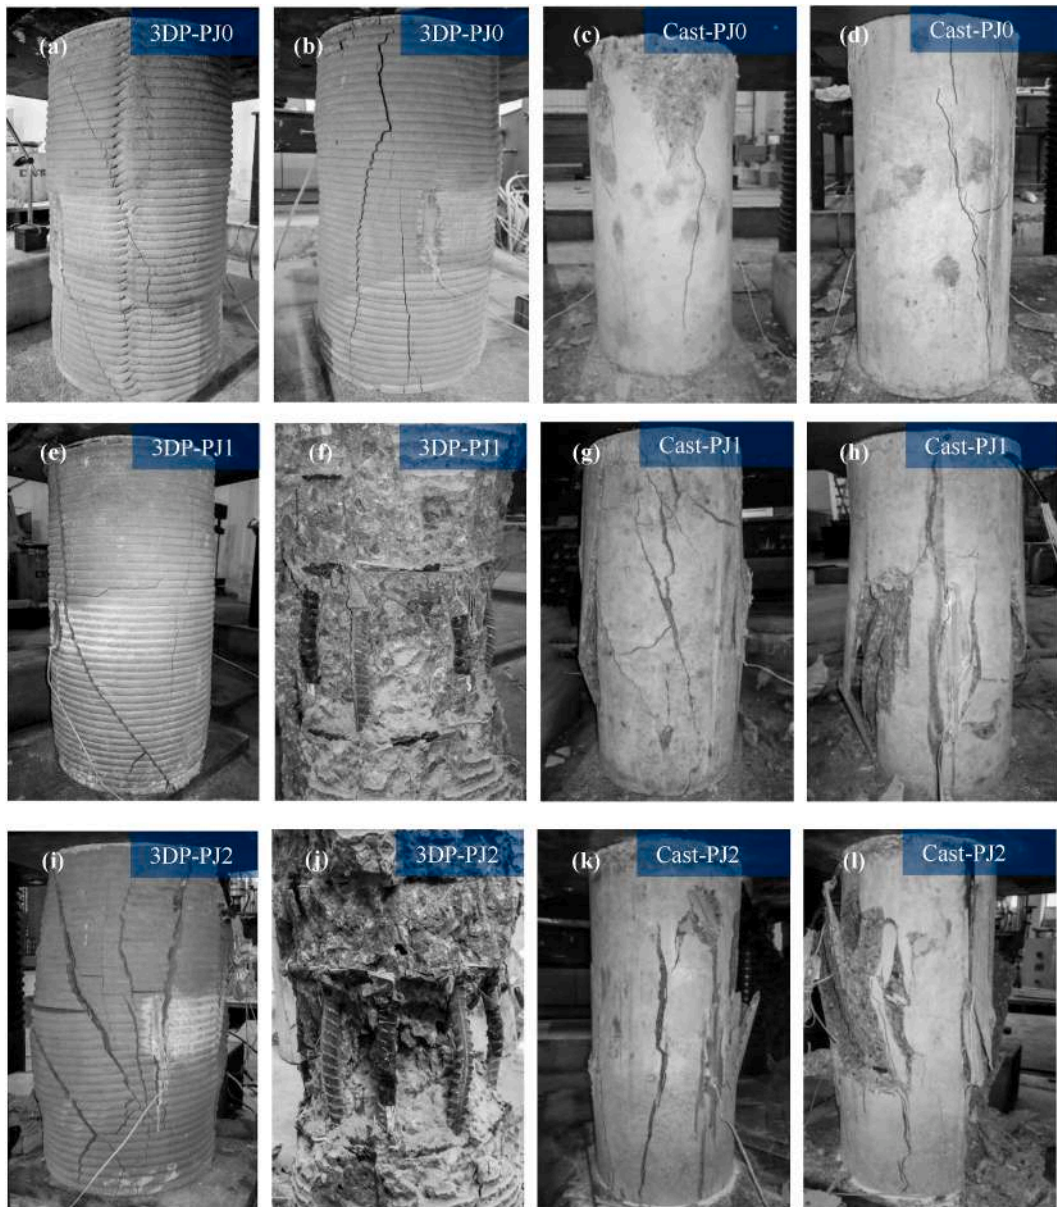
Failure patterns of all tested composite column specimens (a) Inclined crack of 3DP-PJ0 specimen at printing interval, (b) Final failure pattern of 3DP-PJ0 specimen, (c) Concrete spalling pattern of Cast-PJ1 specimen, (d) Main fracture formation of Cast-PJ1 specimen, (e) Final failure pattern of 3DP-PJ1 specimen, (f) Steel bar buckling of 3DP-PJ1 specimen, (g) Crack connection pattern of Cast-PJ1 specimen, (h) Final failure pattern of Cast-PJ1 specimen, (i) Final failure pattern of 3DP-PJ2 specimen and (j) Steel bar buckling of 3DP-PJ2 specimen, (k) Crack connection pattern of Cast-PJ2 specimen, (l) Final failure pattern of Cast-PJ2 specimen.
